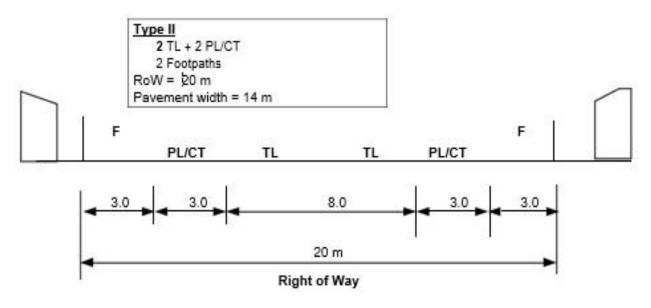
Typical Cross-section for DCRN Roads (with RoW 20m)
